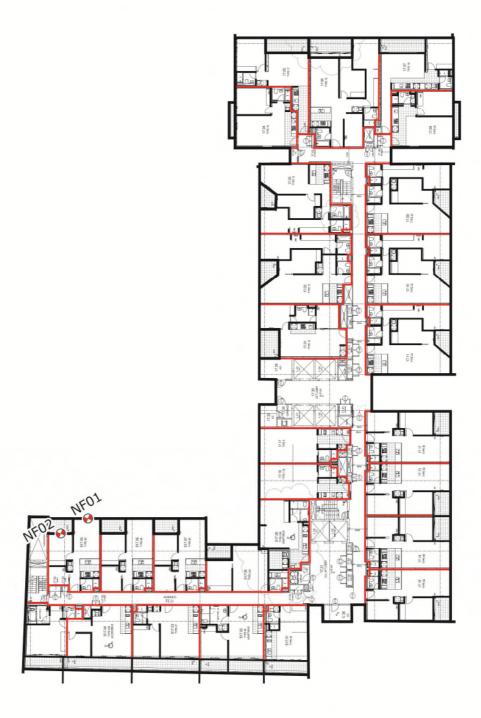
Opening Locations and Internal Apartment Layout - Level 17
